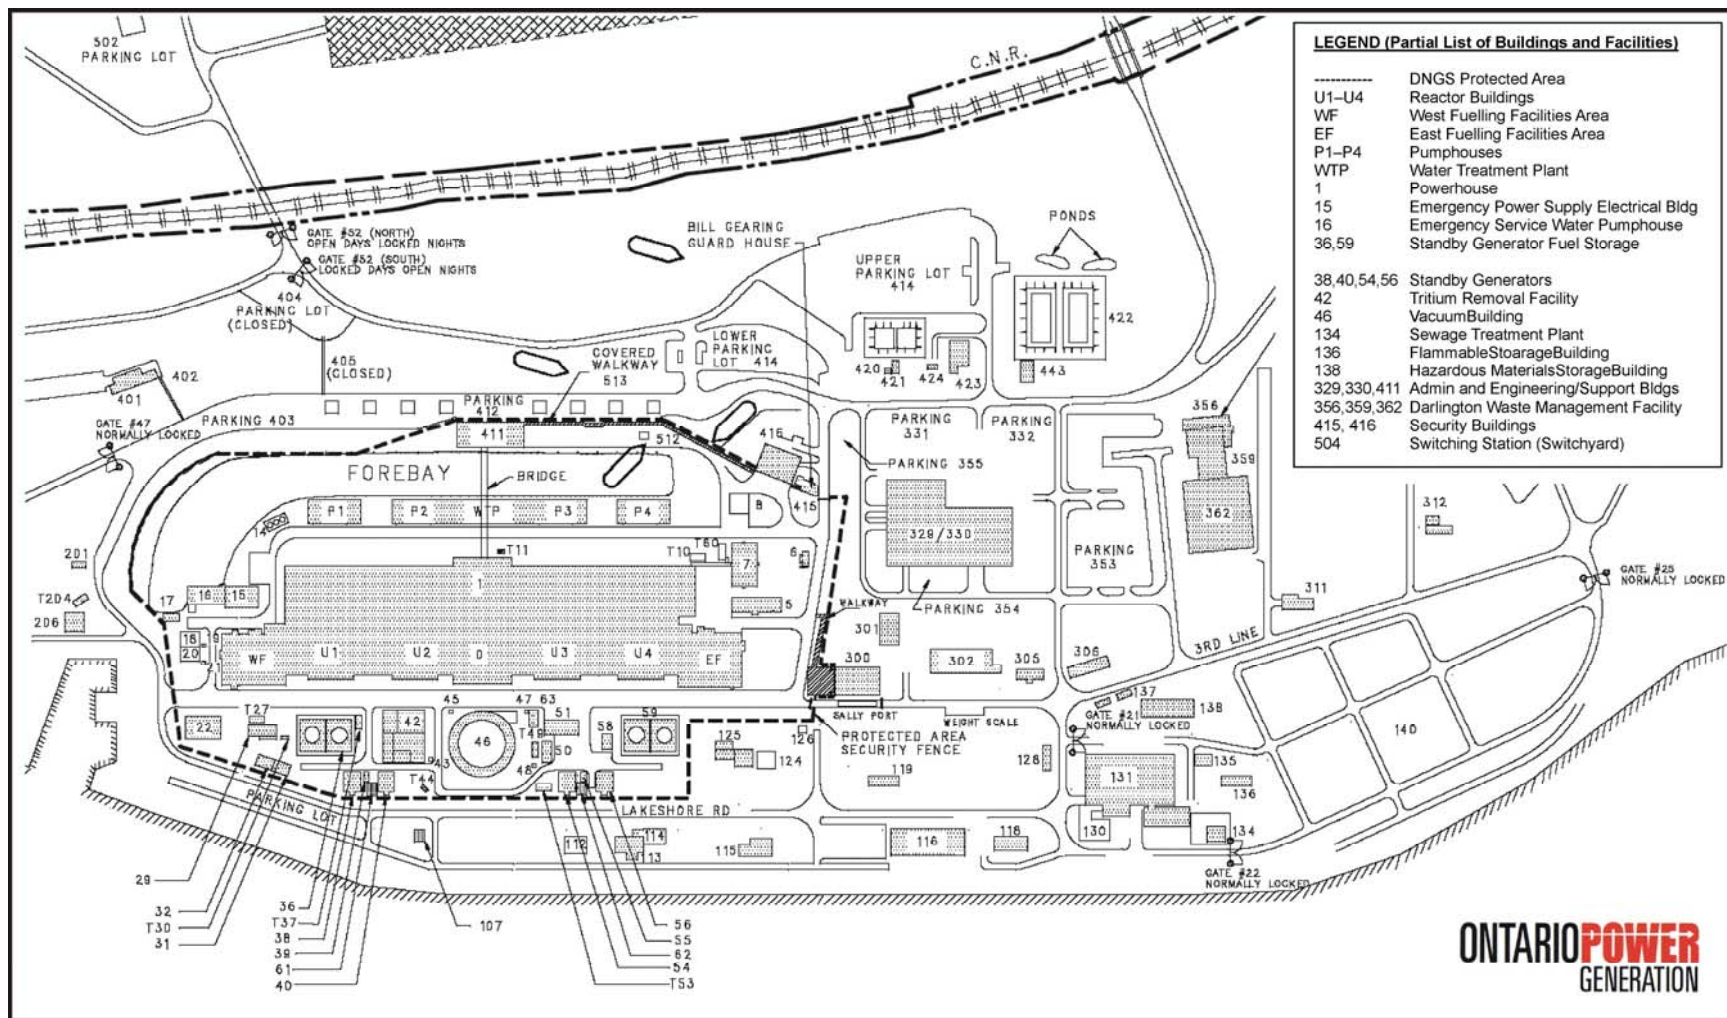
General Layout – DNGS (source: OPG’s EIS)
